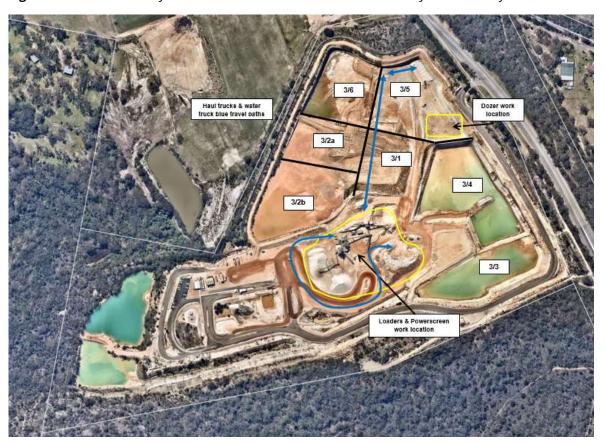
Site Layout and Active Work Locations (March 30, 2021)
